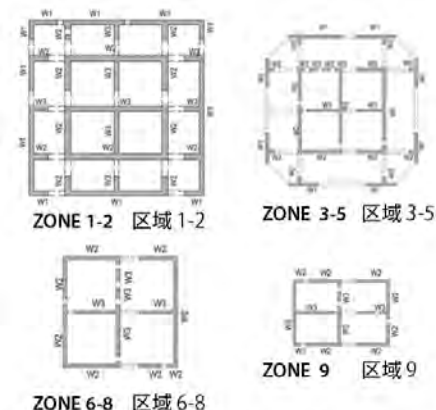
Typical layout plan of Dalian Greenland Center (Source: Guangjing Sha)
